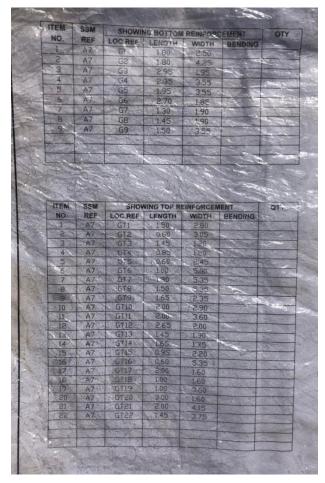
Image shows the table of sizes for BRC used for ground floor slab.
